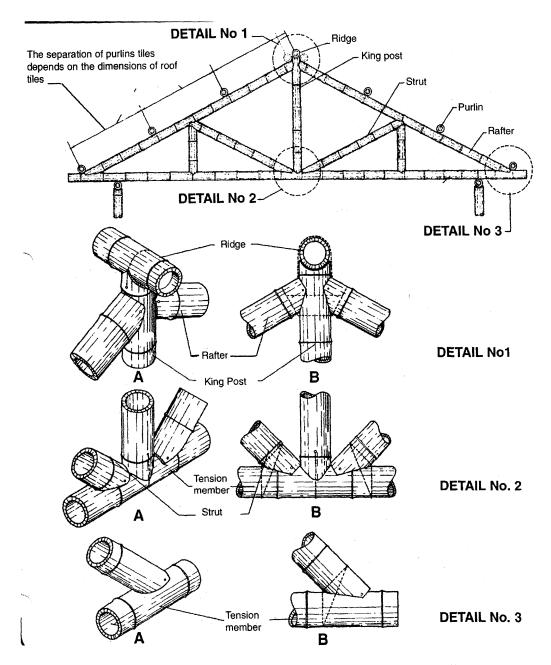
Example of Light Roof Truss – system and details⁴⁴
